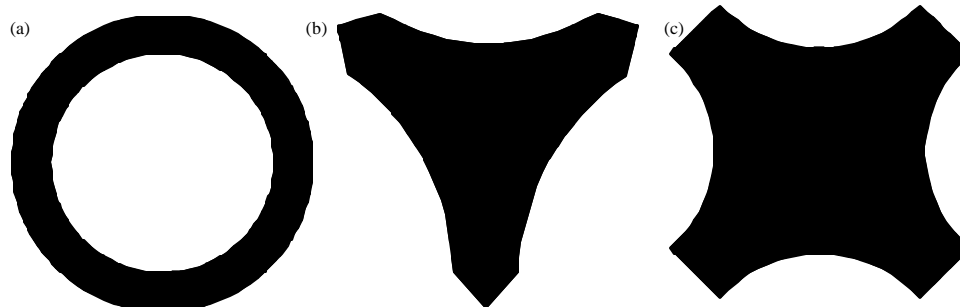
(a-c): Several special section piles (a) Ring section pile, (b) Y-shaped section pile and (c) X-shaped section pile
